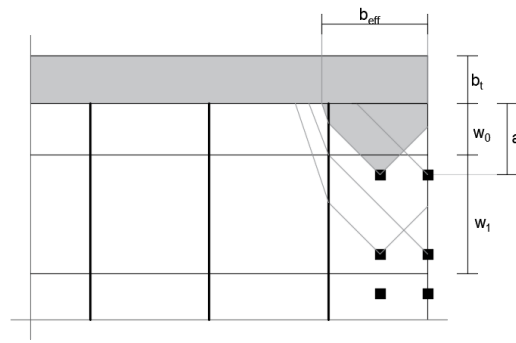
Load distribution towards side girder in load situation 2 for massive floor girders with orthotropic behaviour
